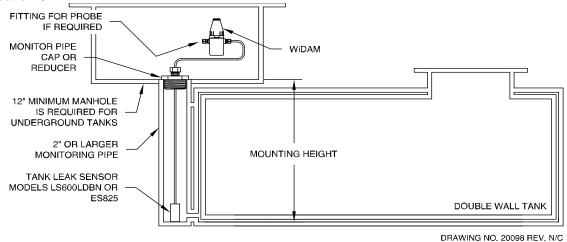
Leak Sensor Installation - Steel Vaulted Tanks
